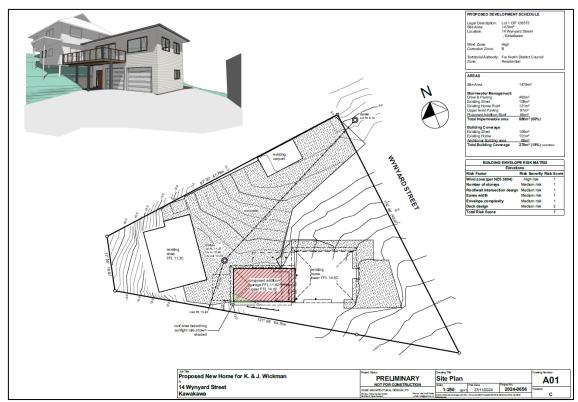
Snip of Proposed Site Plan Provided by Core Architectural Design Ltd (Ref No: 2024-0656 Rev C, dated: 27.11.2024)
